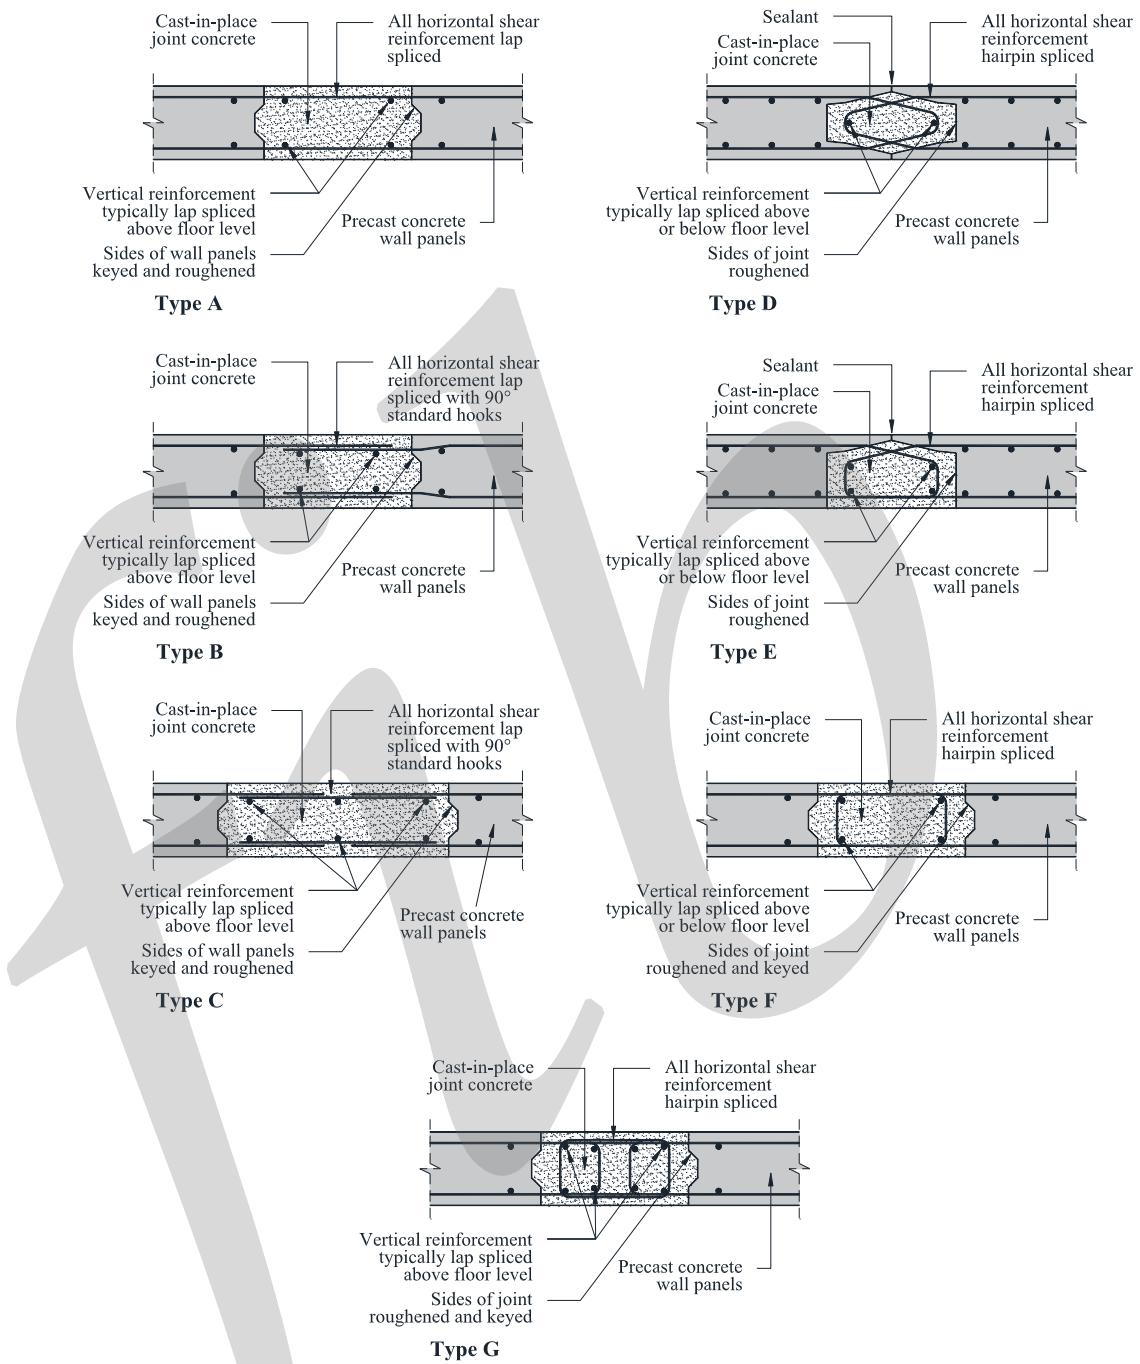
Monolithic precast concrete wall construction joints (based on NZS 3101:2006)
